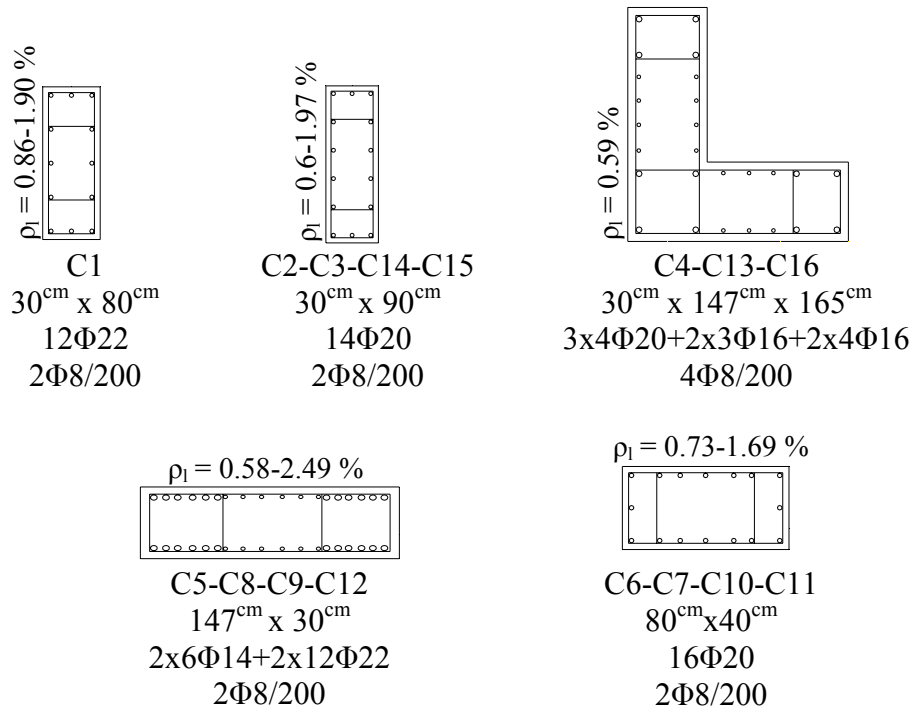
Cross-section dimensions, longitudinal and transverse reinforcement of typical column sections at the ground level (adapted from Çağnan, 2001)
